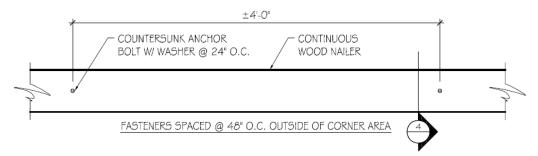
B - TYPICAL ROOF EDGE WOOD BLOCKING - THROUGH BOLT ANCHORAGE
